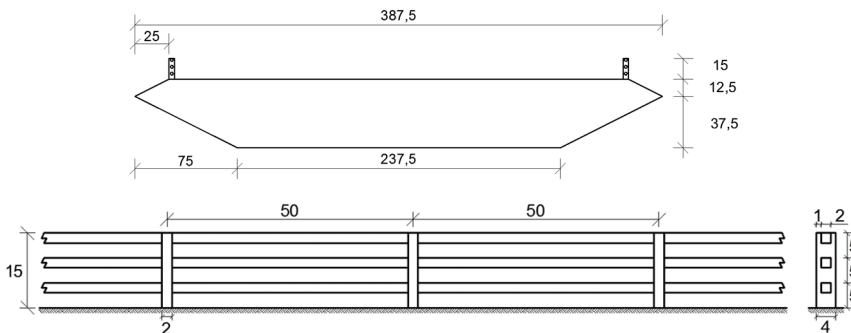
Geometrical dimensions of (a) the bridge model (b) the railing
